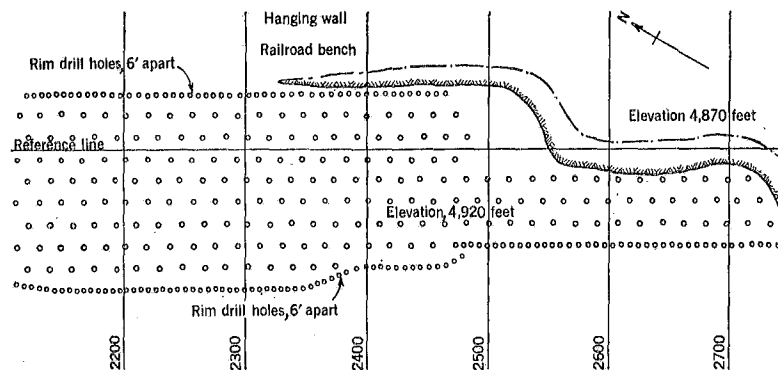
Plan of blast no. 4, 4,920 bench, Flin Flon mine.
